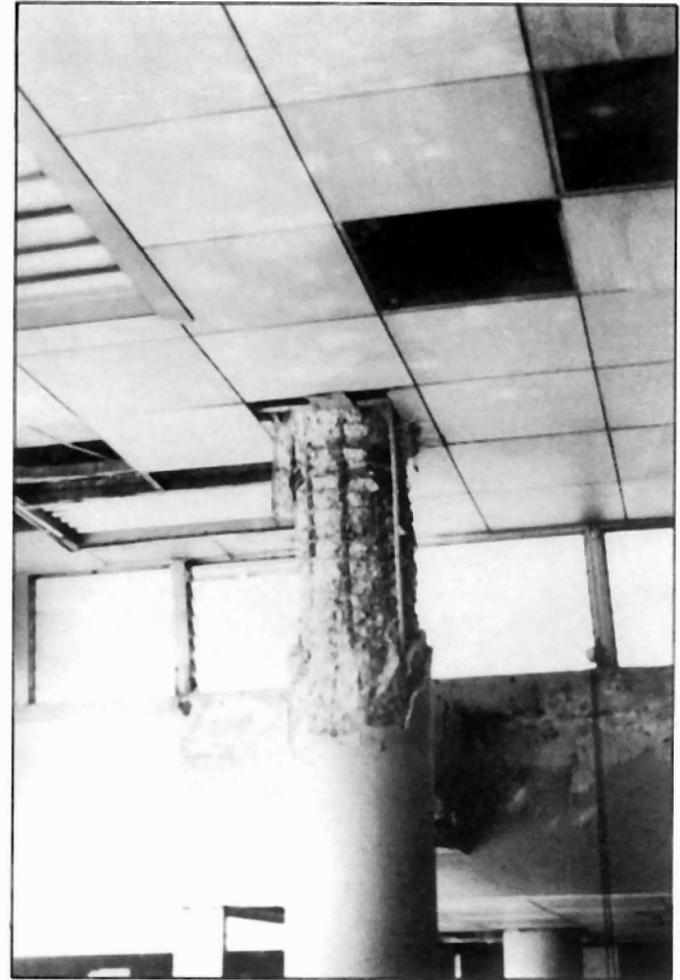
COLUMN FAILURE AT NATIONAL LIBRARY.
